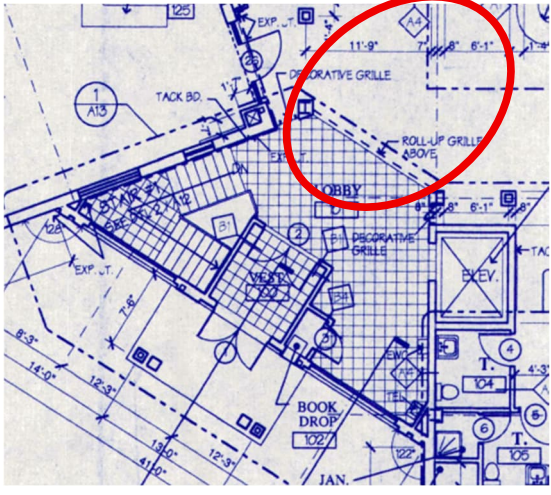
FLOOR PLAN DETAIL @ LEAK AREA
